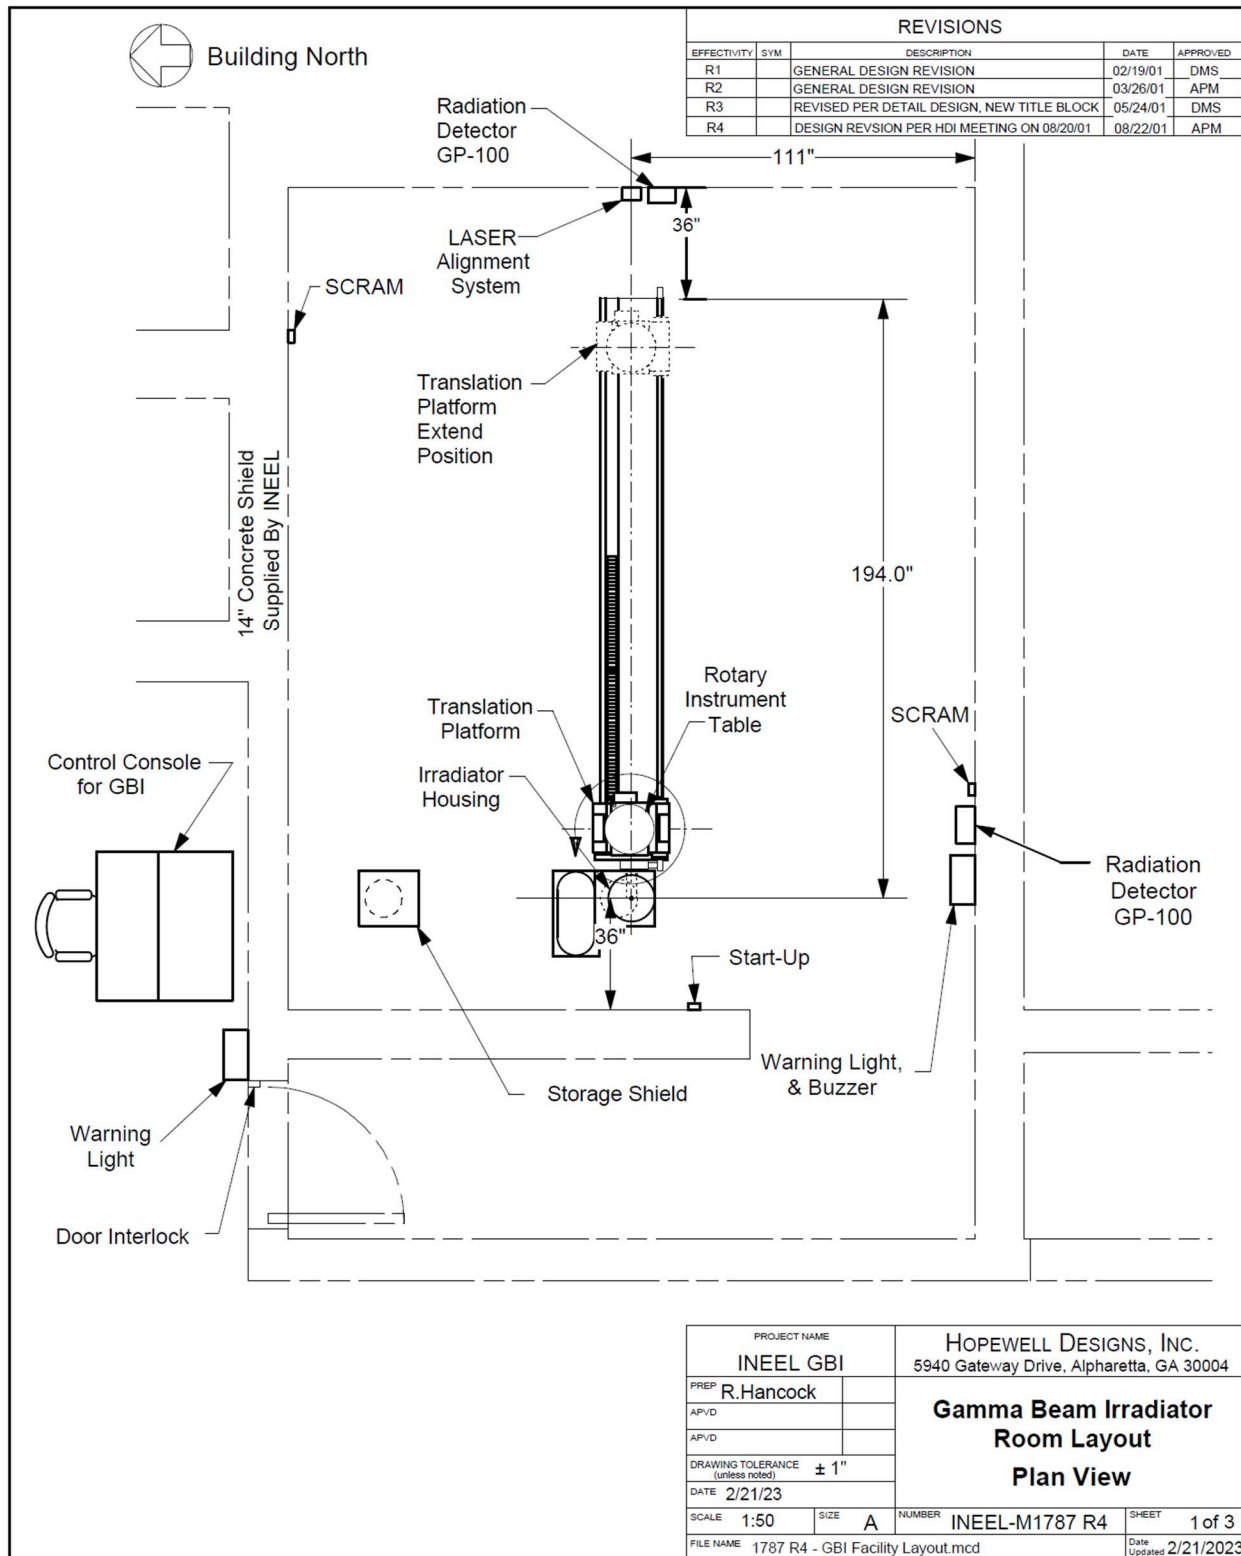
Gamma Beam Irradiator Room Layout Plan View [12]
